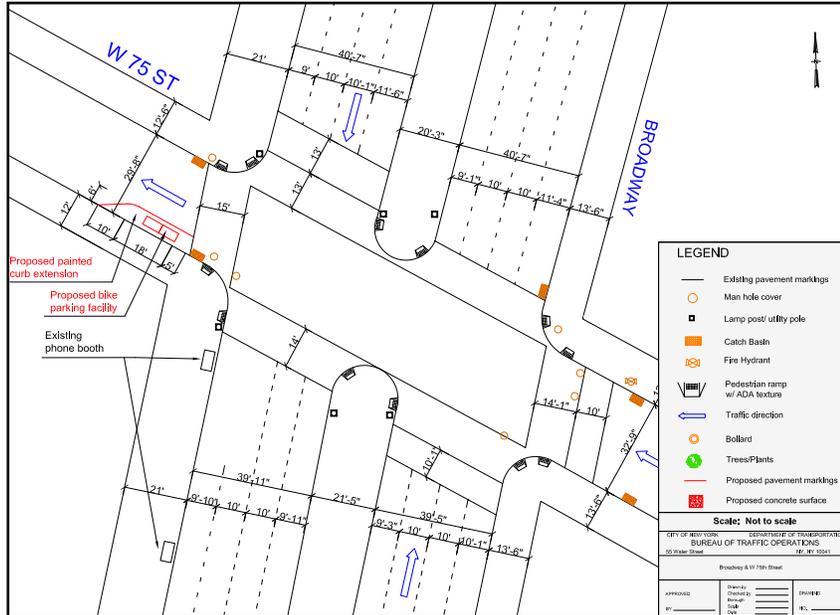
Proposed On-Street Bicycle Parking – West 75th Street & Broadway
